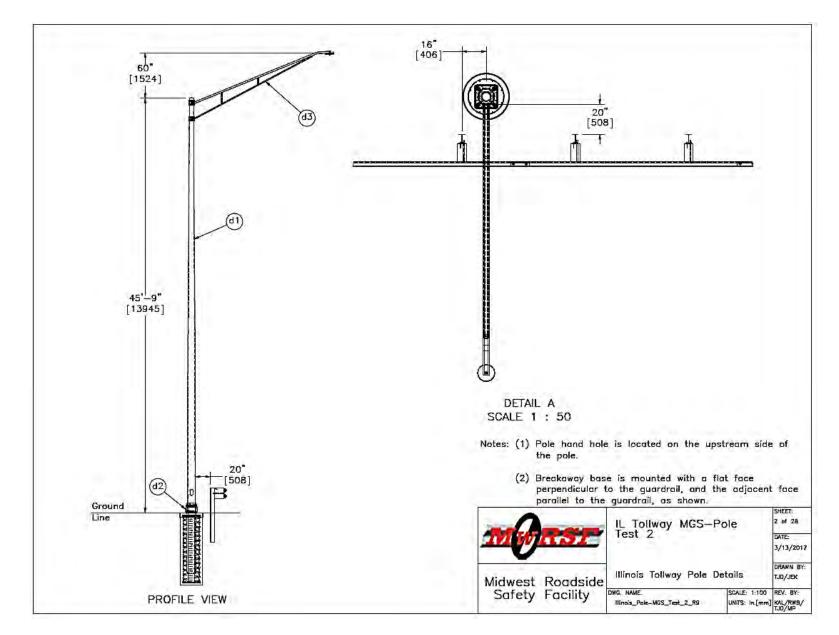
Illinois Tollway Pole Details, Test No. ILT-2
